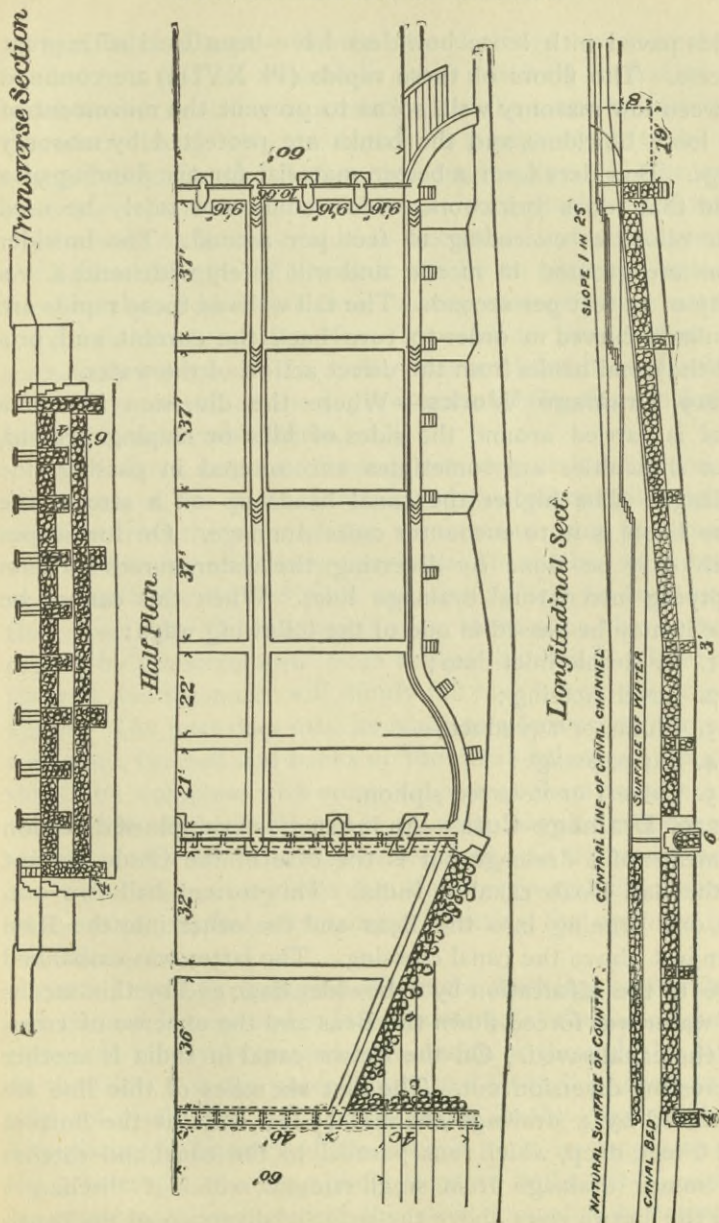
PLATE XVIII.—PLAN OF RAPIDS, BARI DOAB CANAL, INDIA.
